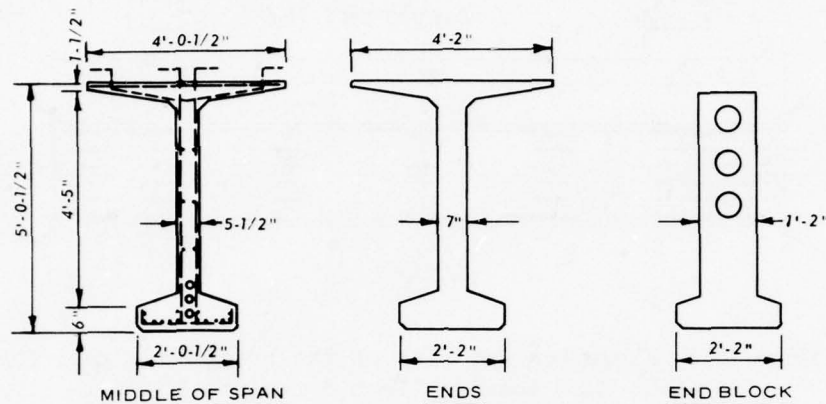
Section of prestressed concrete bulb-T girder (from Reference 18)
